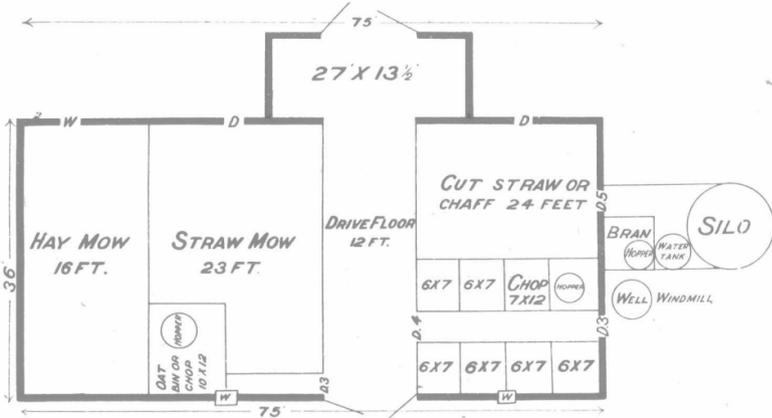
FIG. I.—UPPER-FLOOR PLAN OF BARN FOR 100-ACRE FARM.
